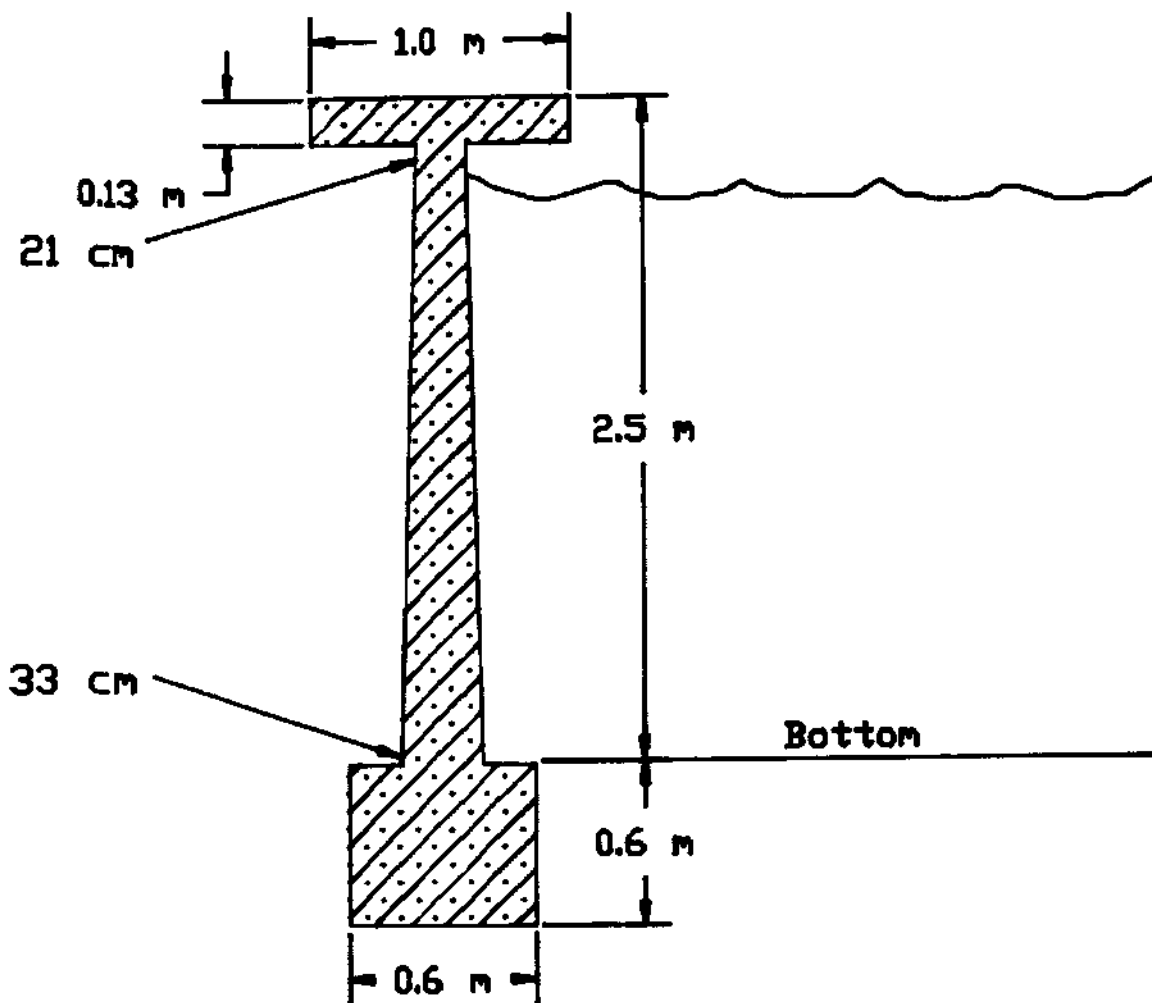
Cross-section of reinforced concrete pond wall at farm under construction near Tungkang Marine Laboratory. The pattern of re-bar reinforcement is not known. The walls are buttressed on the outside at 3.4 m intervals.
